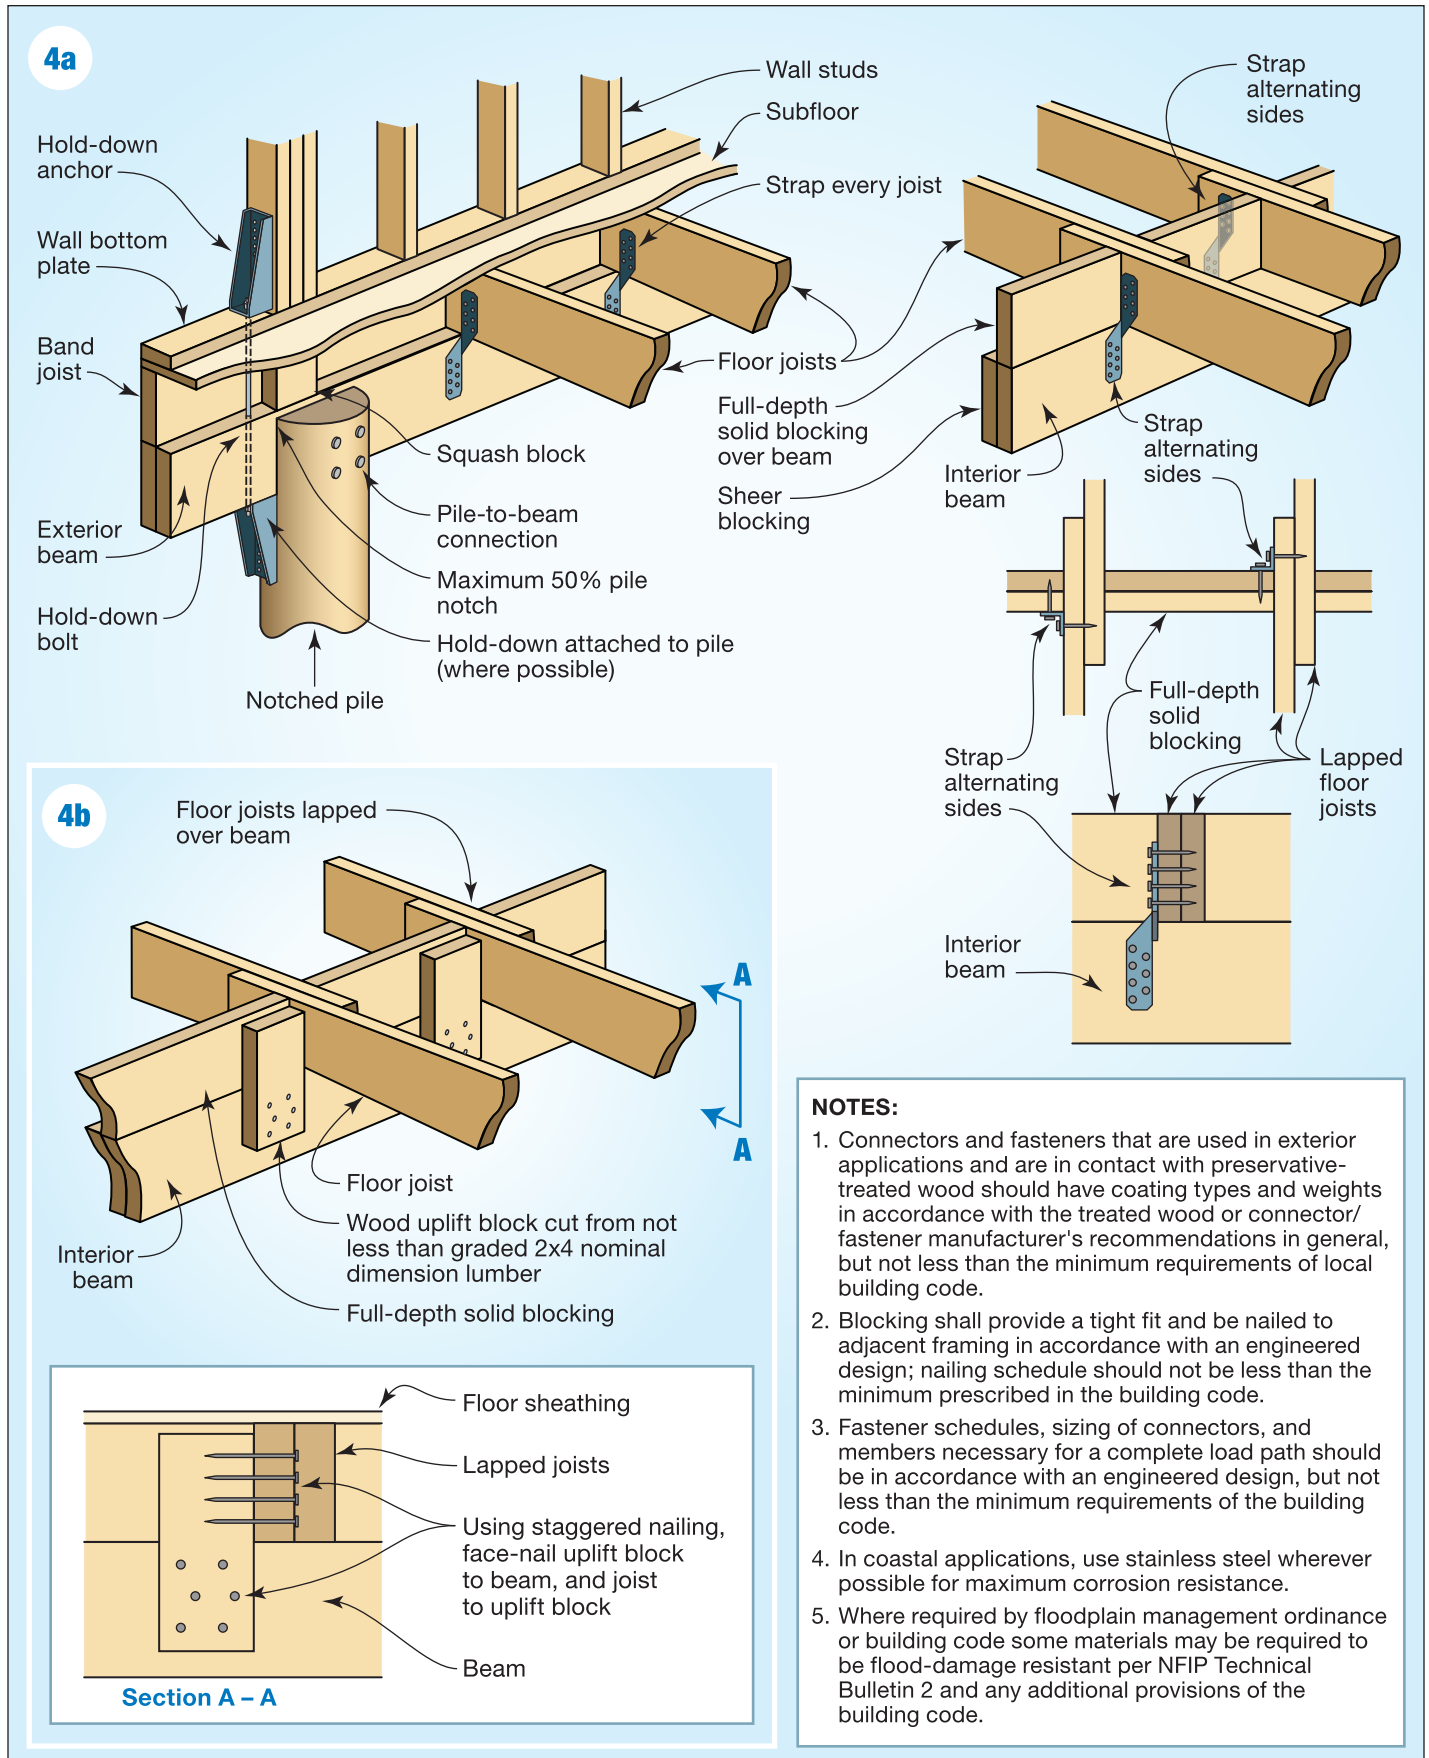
Detail of an elevated floor-to-pile connection using metal connectors and full-depth solid blocking (4a); detail of an elevated floor-to-pile connection using wood uplift blocking and full-depth solid blocking (4b).
